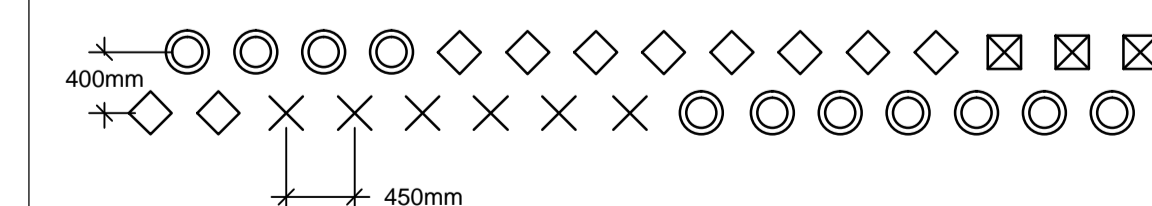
HEDGE AND TRANSPLANT PROTECTION Scale 1:20
